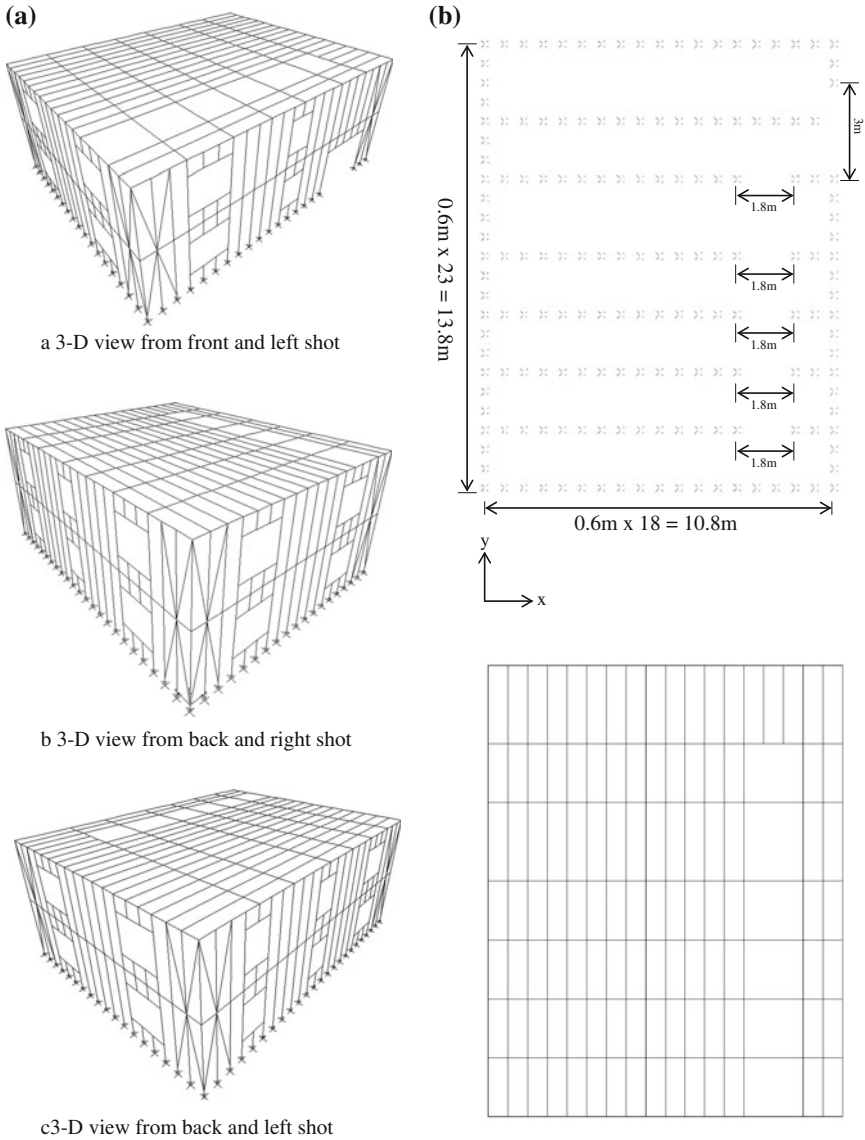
1211-member three dimensional lightweight cold-formed steel frame, a 3-D views from different shots, b Plan views, c First and second floors top views without slabs
